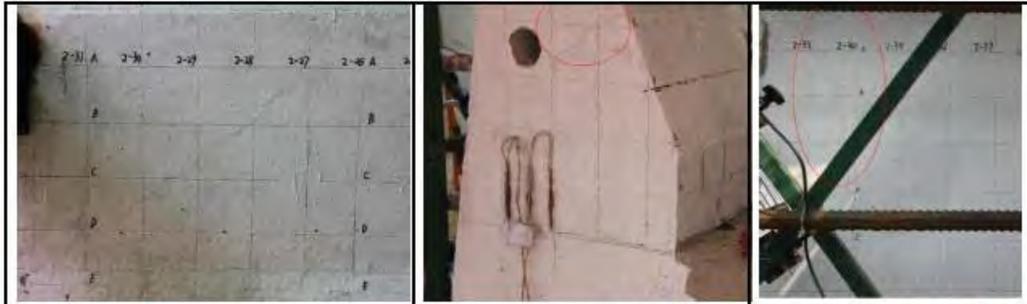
M2 Eccentric patch action of 430kN : crack development at inner face, joint face and outer face.
